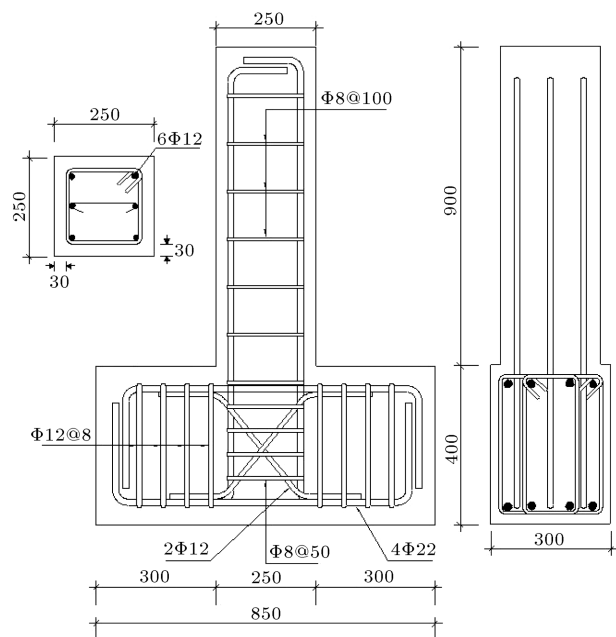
Reinforcing details of the specimens (all dimensions are in mm).
